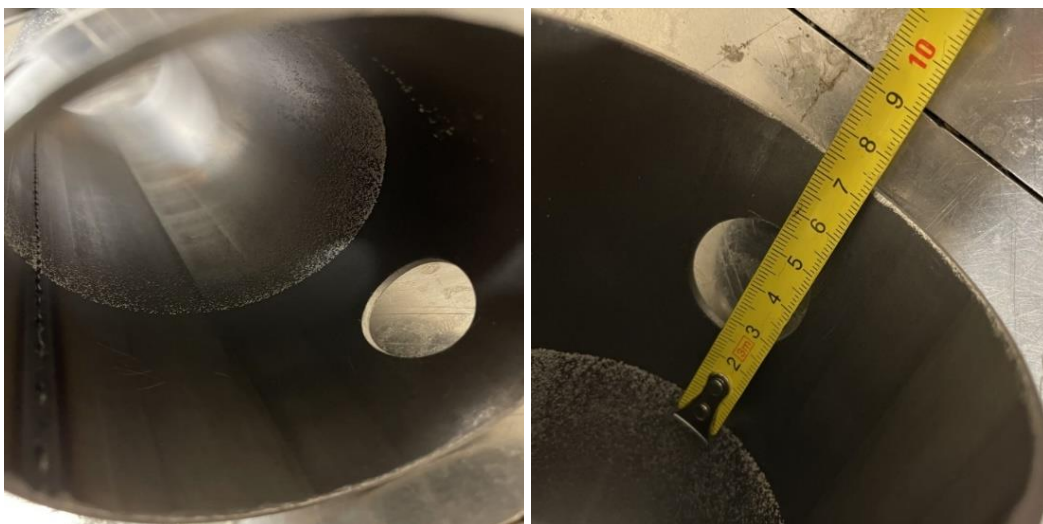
The soil column height developed inside the 101.6 mm pile in the unsaturated soil during installation.
